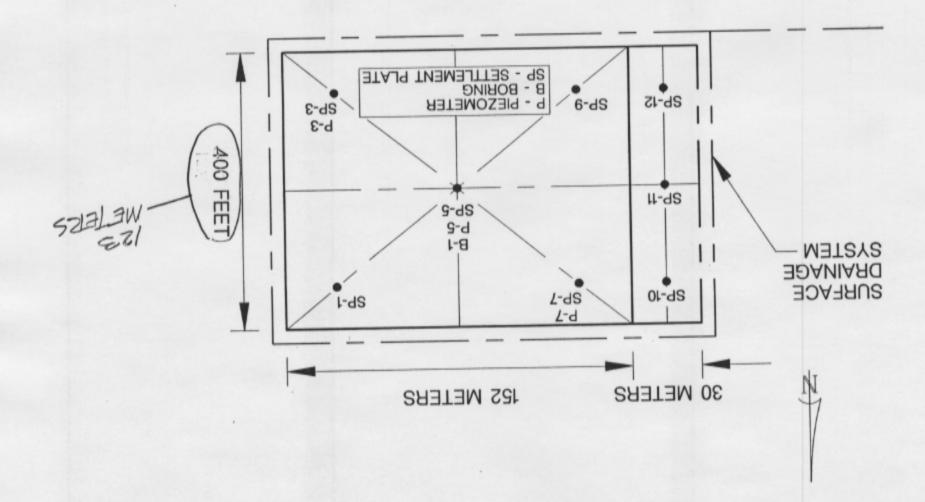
Location of Settlement Plates, Piezometers, and Boring in Test Section
